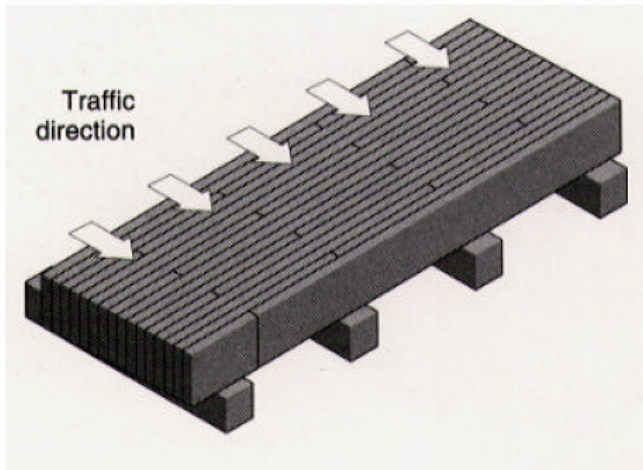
Example of a nail-laminated transverse deck, [16]
